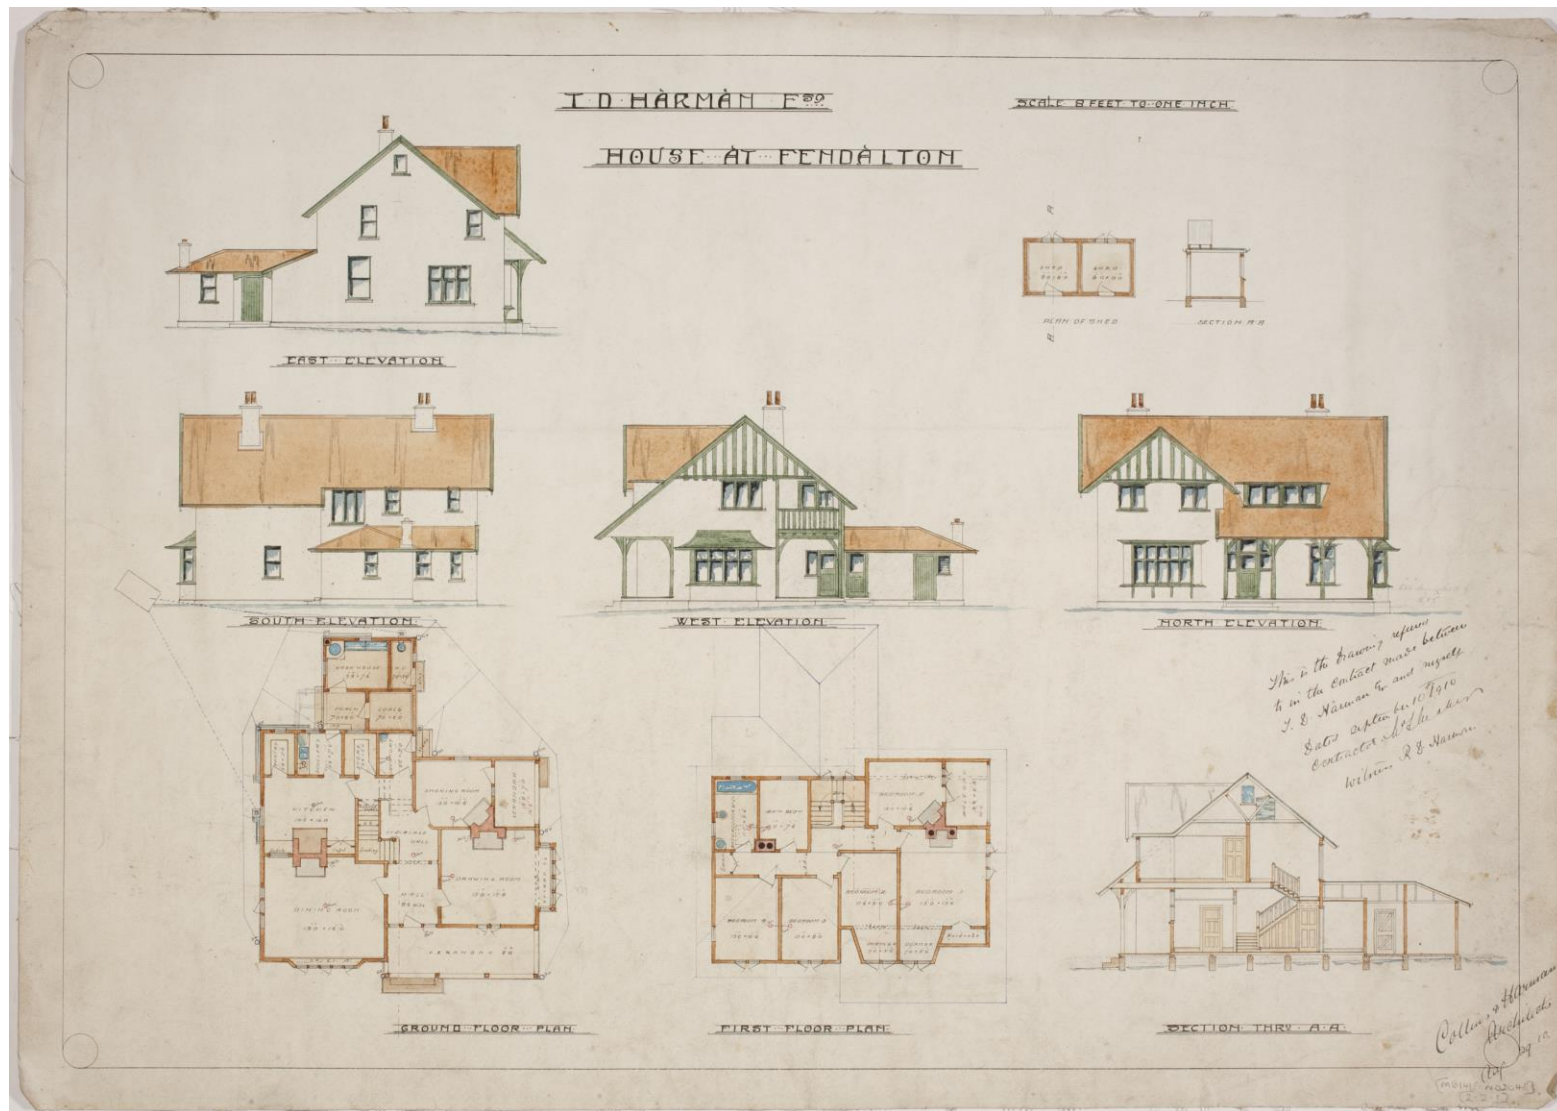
Collins and Harman, T. D. Harman, Esq., House at Fendalton, plans, elevations and sections (1910).
